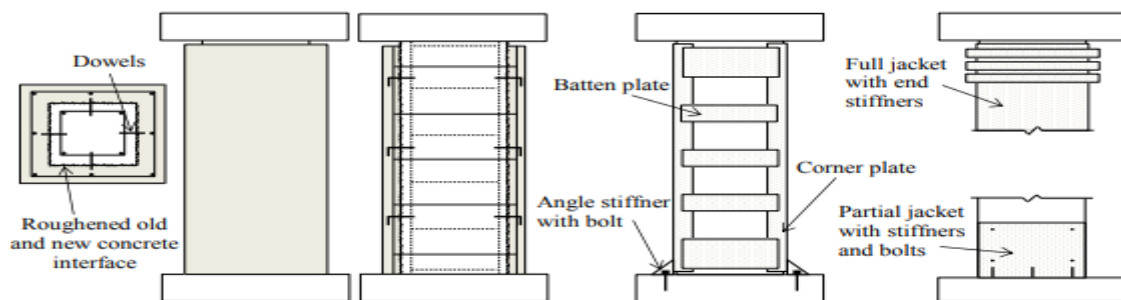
Strengthening scheme examples: a) concrete jacketing, b) steel cage, c) steel jacketing
